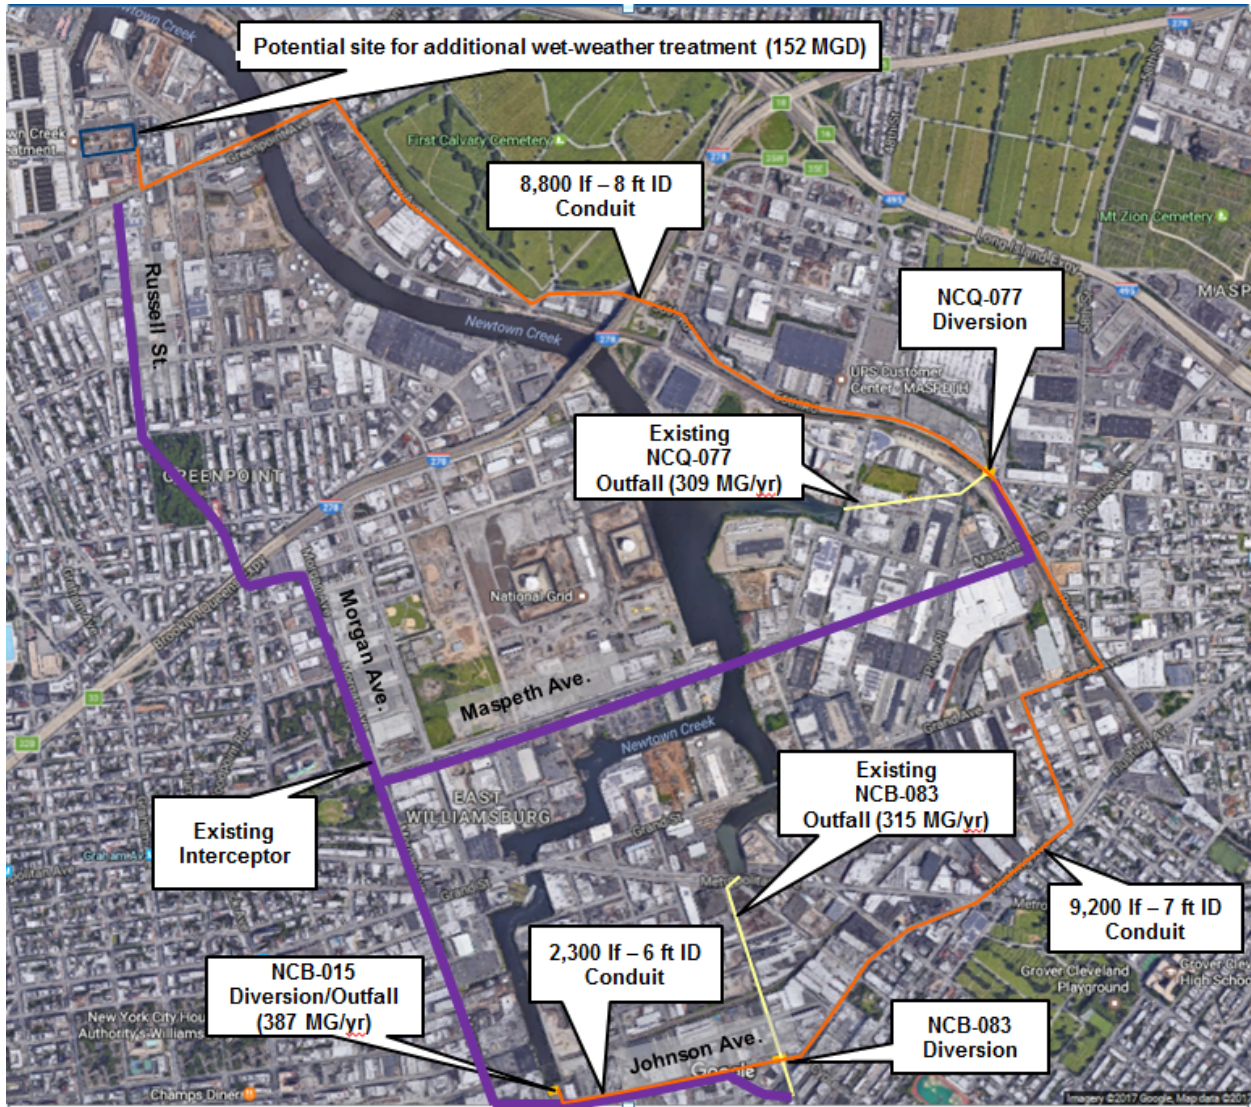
Layout of Alternative RTB-1 – Retention Treatment Basin with Consolidation Conduit for Outfalls NC-015, NC-083 and NC-077
